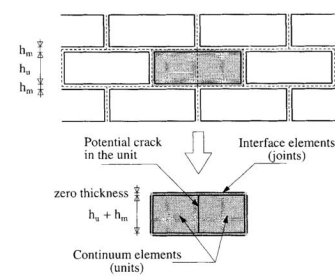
Discrete modelling of masonry. Bricks as elastic elements and mortar and potential brick crack lines as interface elements, [Lourenco and Rots, 1997].
